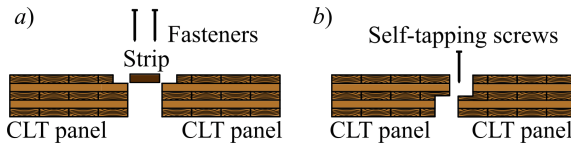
Two types of CLT inter-panel connections: a) single surface spline; b) half-lapped joint.
